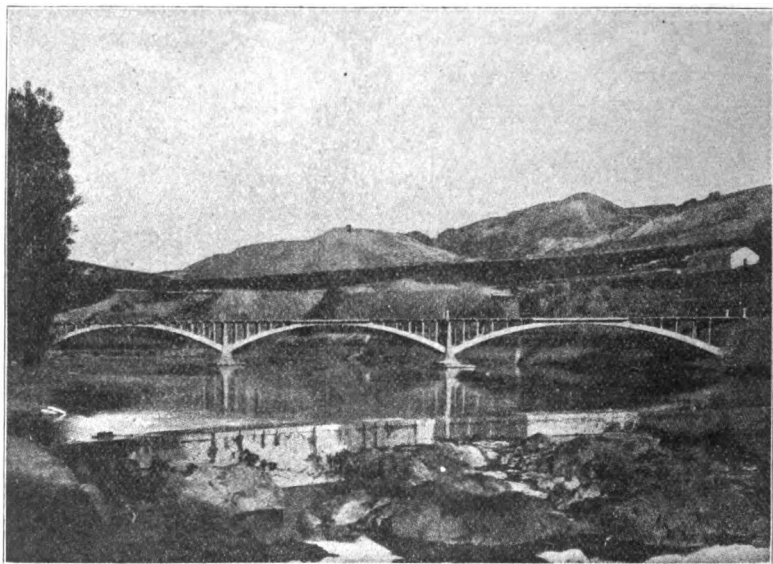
Highway and Electric Railway Bridge at Bilbao, Spain. Consists of five arches of 120 ft. span, of which only three are visible in the illustration. This bridge has a much lighter appearance than a steel bridge.
